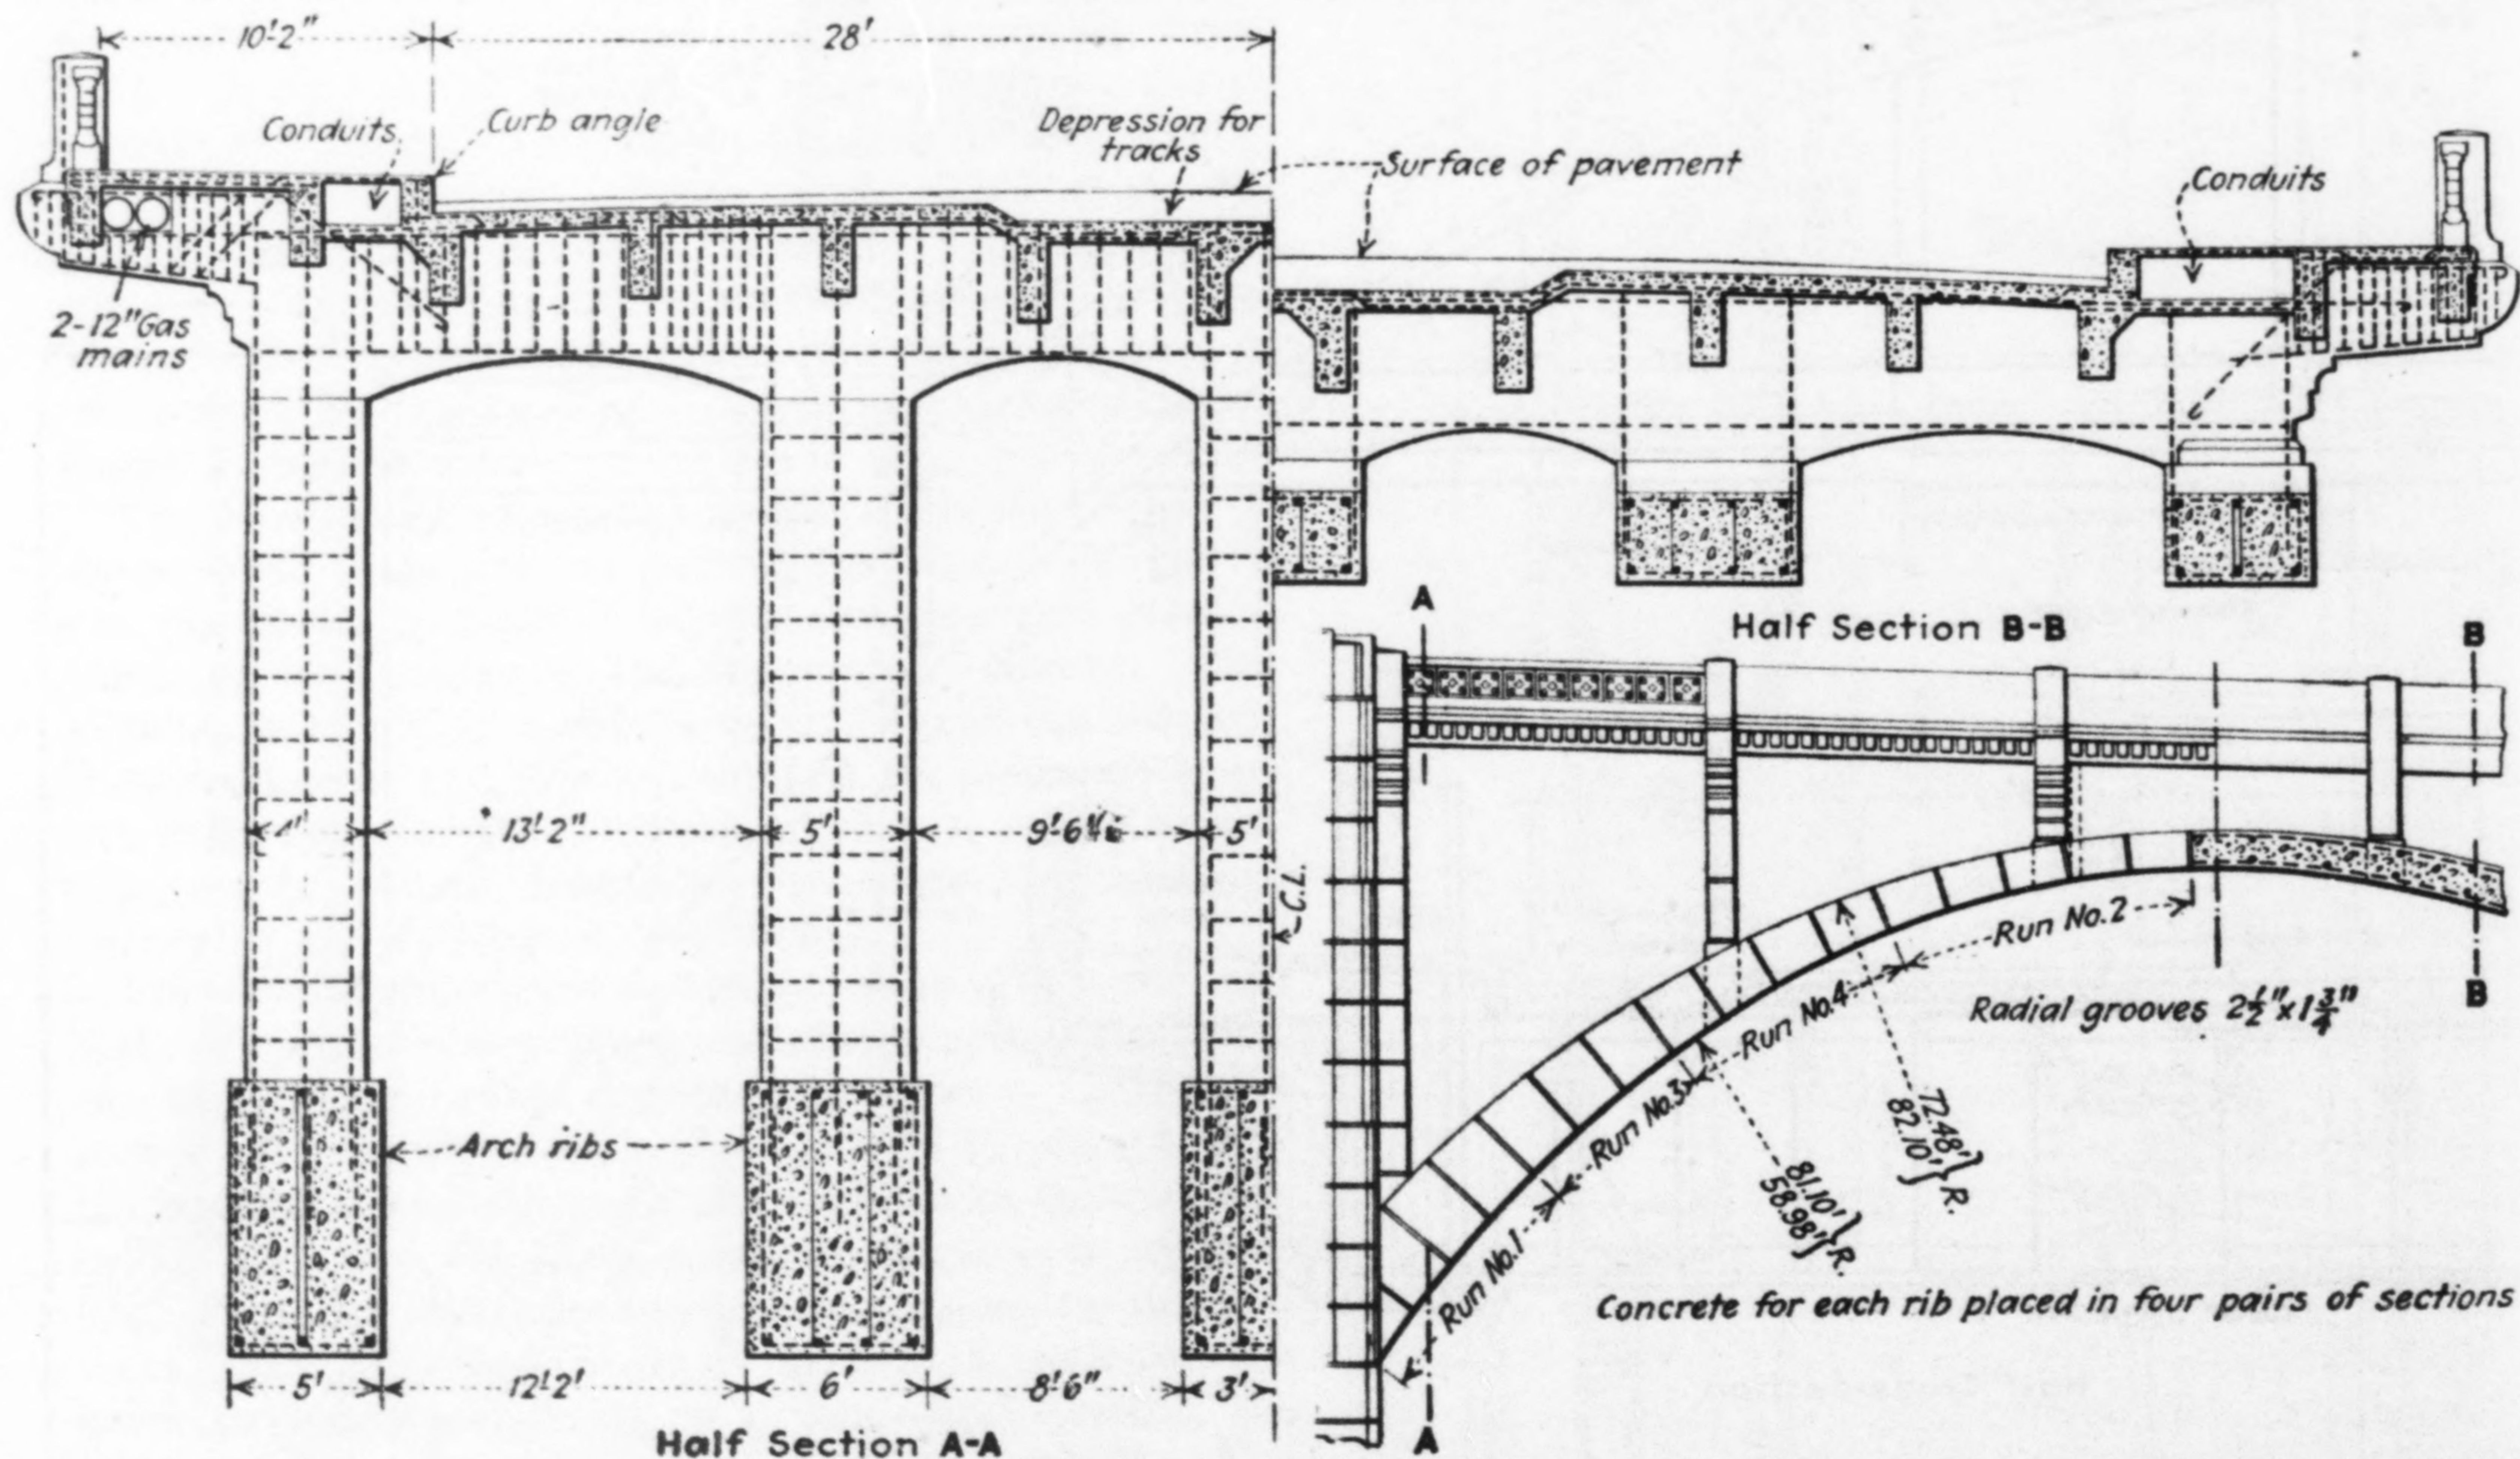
FIVE-RIB ARCH OF 112-FT. SPAN
